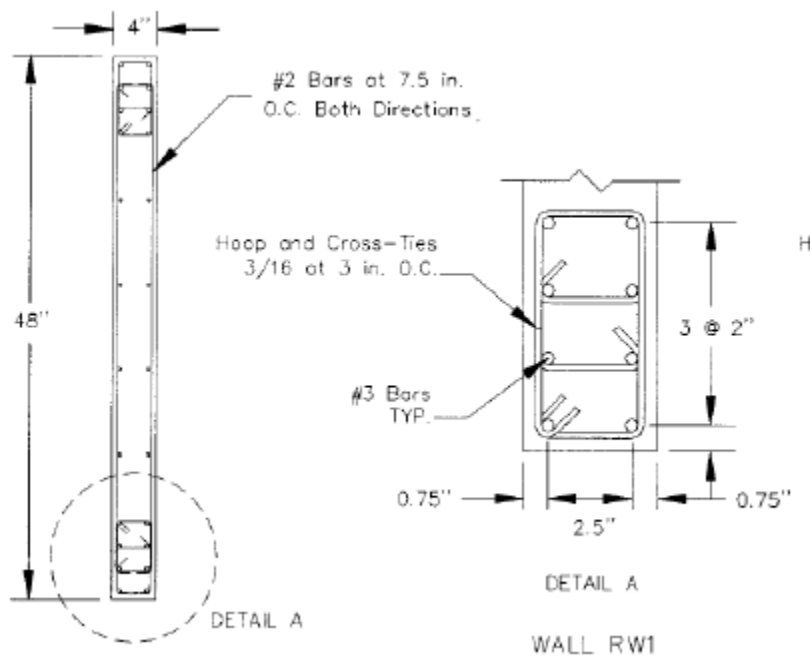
Specimen RW1 Cross-Section at Specimen Base
